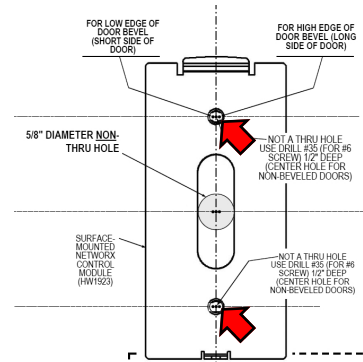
B: $7/64"$ PILOT HOLE ON INSIDE DOOR SURFACE FOR CONTROL UNIT PLATE
